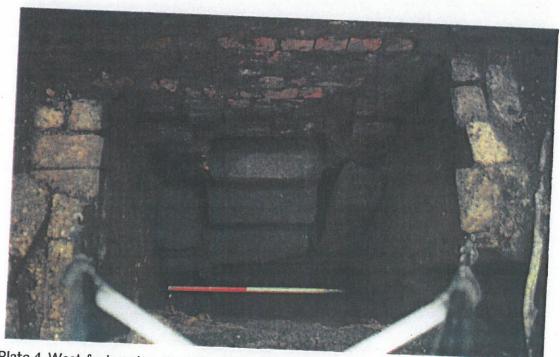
West-facing elevation of wall (2005) and structures (2034), (2035) & (2036)
